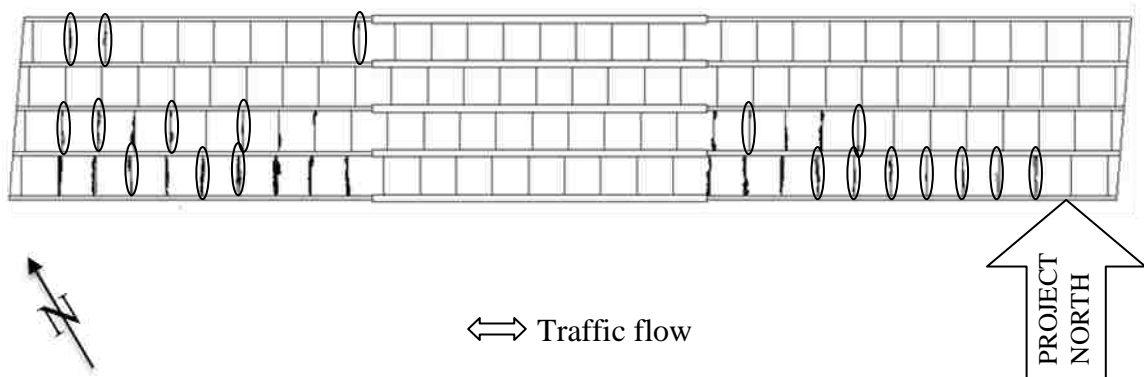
Panel cracking locations on Bridge A4709 in Mexico, MO
